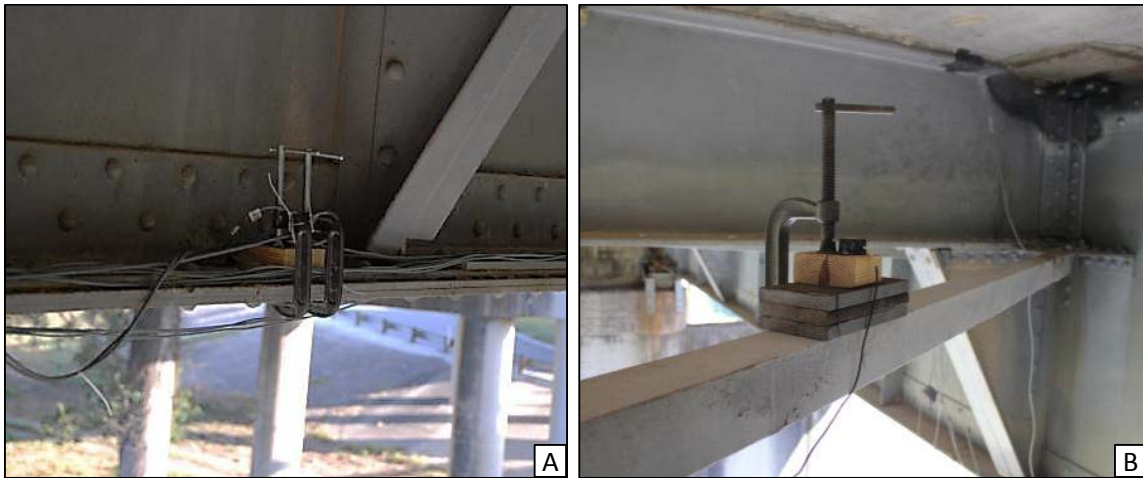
C-clamps were used to attached the accelerometers to the Medina River bridge at (a) the bottom flange of a longitudinal girder and (b) midspan of a lateral brace (13 lb of steel plates are also shown).
